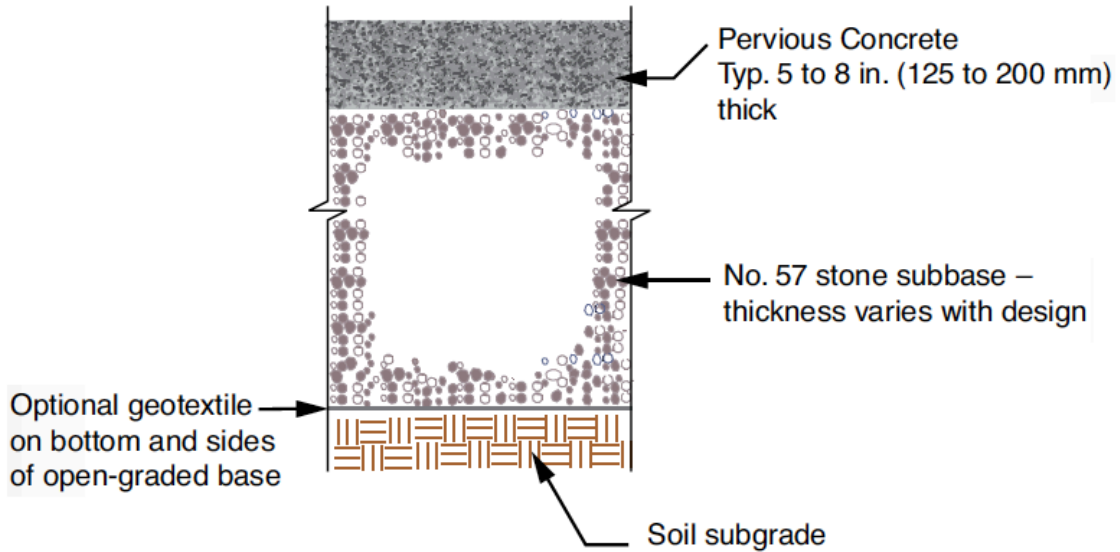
Typical Pervious Concrete Section, *image courtesy of the Interlocking Concrete Pavement Institute.
